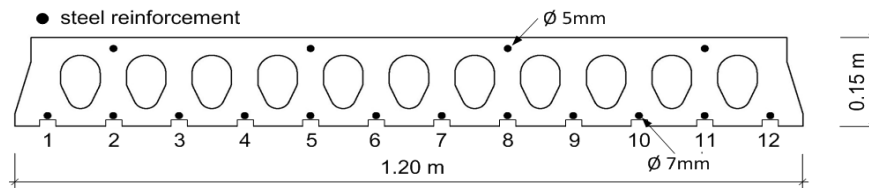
Cross-section of the panels with the reinforcement in the upper and lower part of the slab. At the bottom at half length the concrete was removed to have access to the steel wires for cutting.
